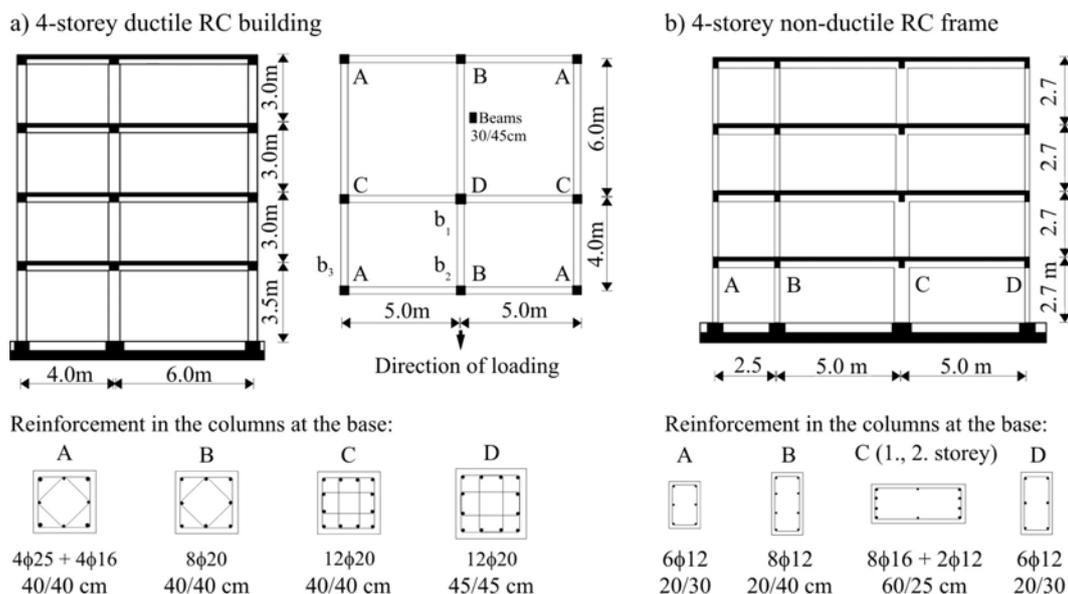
The plan and the reinforcement in the columns at the base for a) 4-storey ductile RC building and b) 4-storey non-ductile RC frame.
